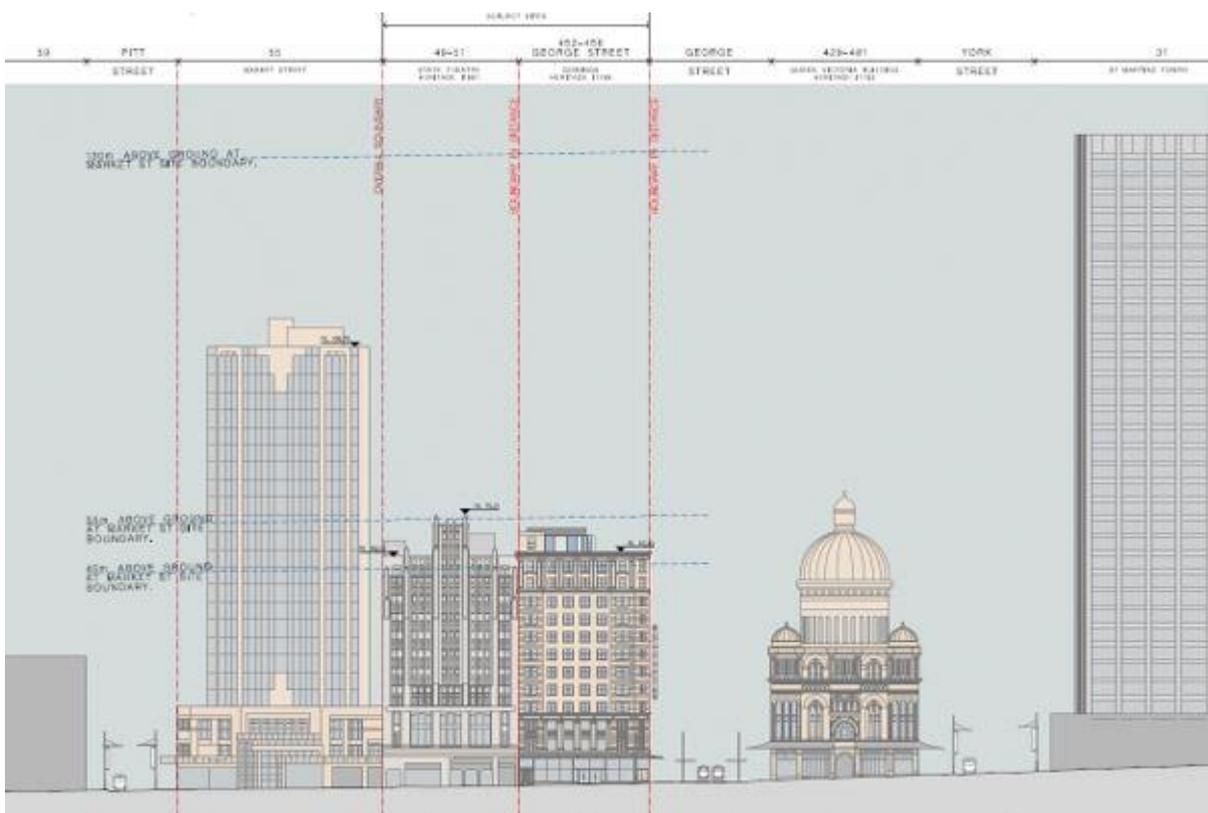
Market Street (north) streetscape elevation, noting that the only new works visible in this elevation is the rooftop addition setback approximately 3.5 metres from Market Street
